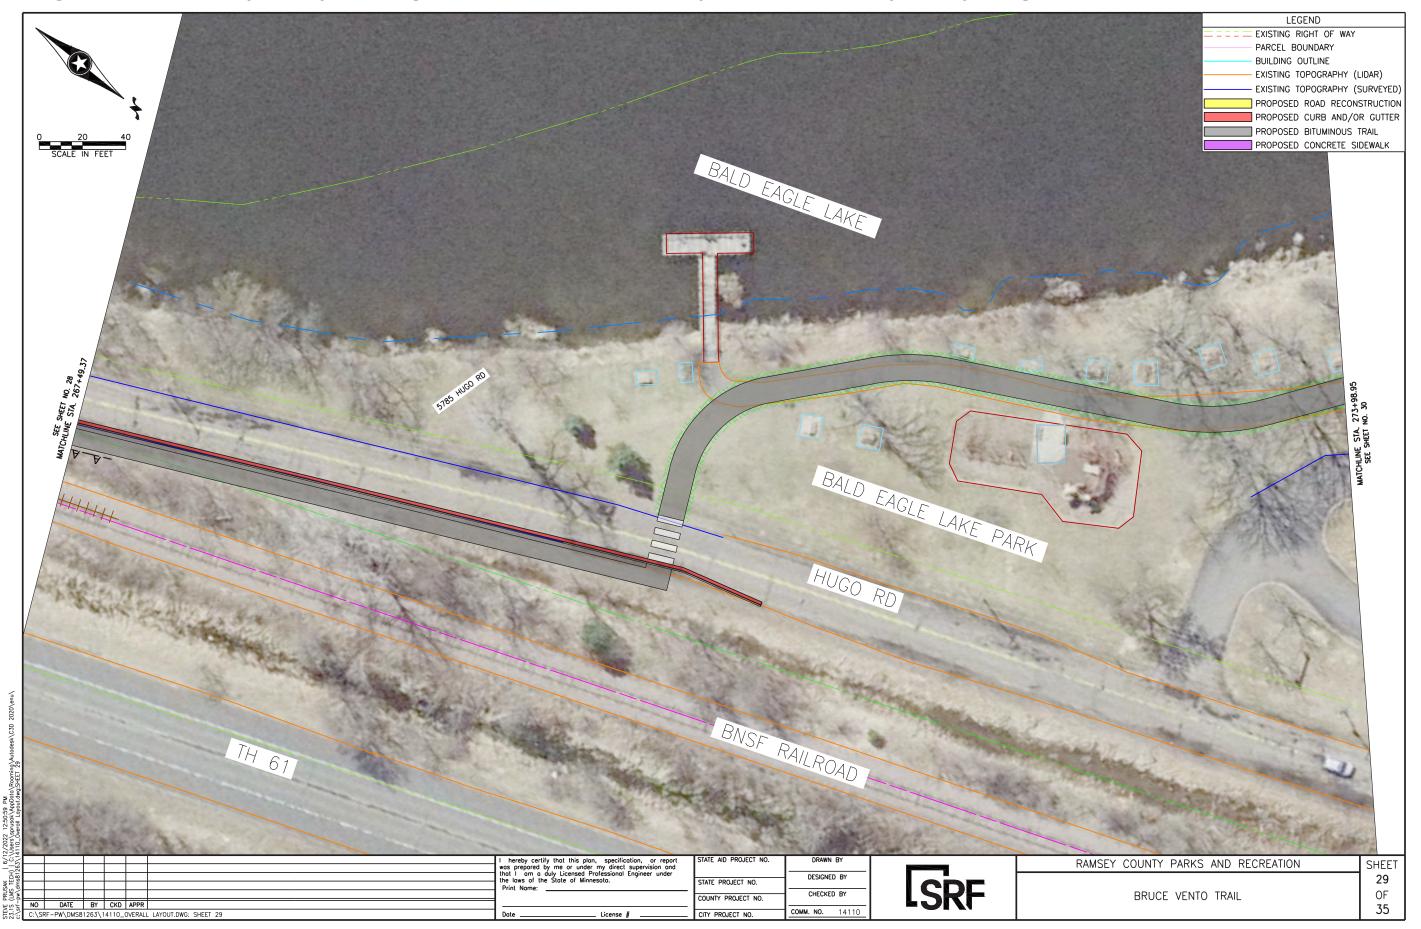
Two-Way Roadway on Hugo Road at Pinch Point Section.
